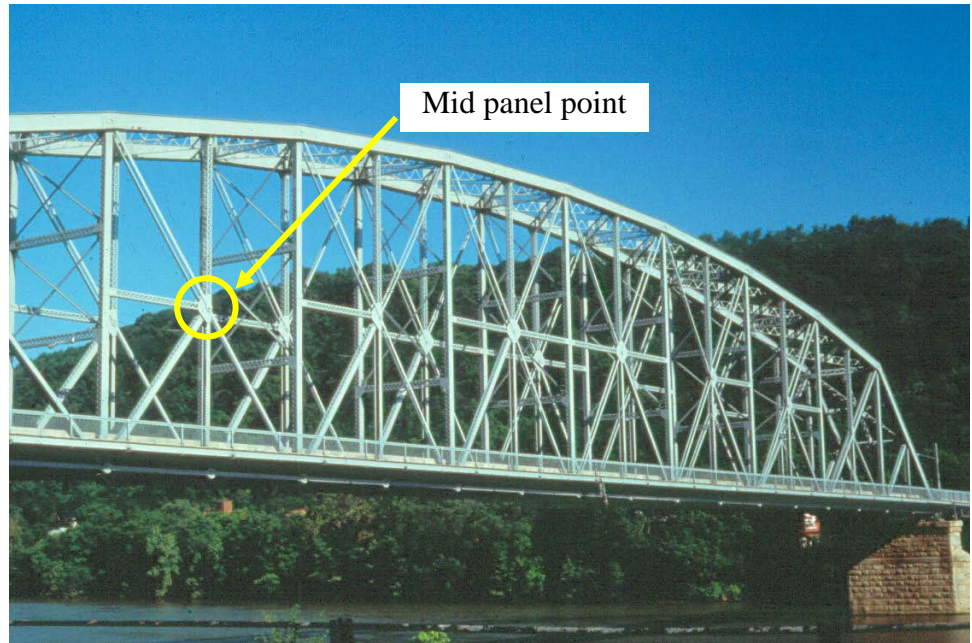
A Pennsylvania Truss, a Subdivided Pratt Truss with a Camel Back Top Chord
